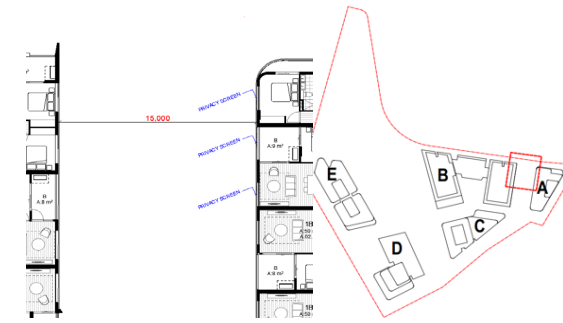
F1.4 Building A Plan. Privacy screens location annotated in blue
